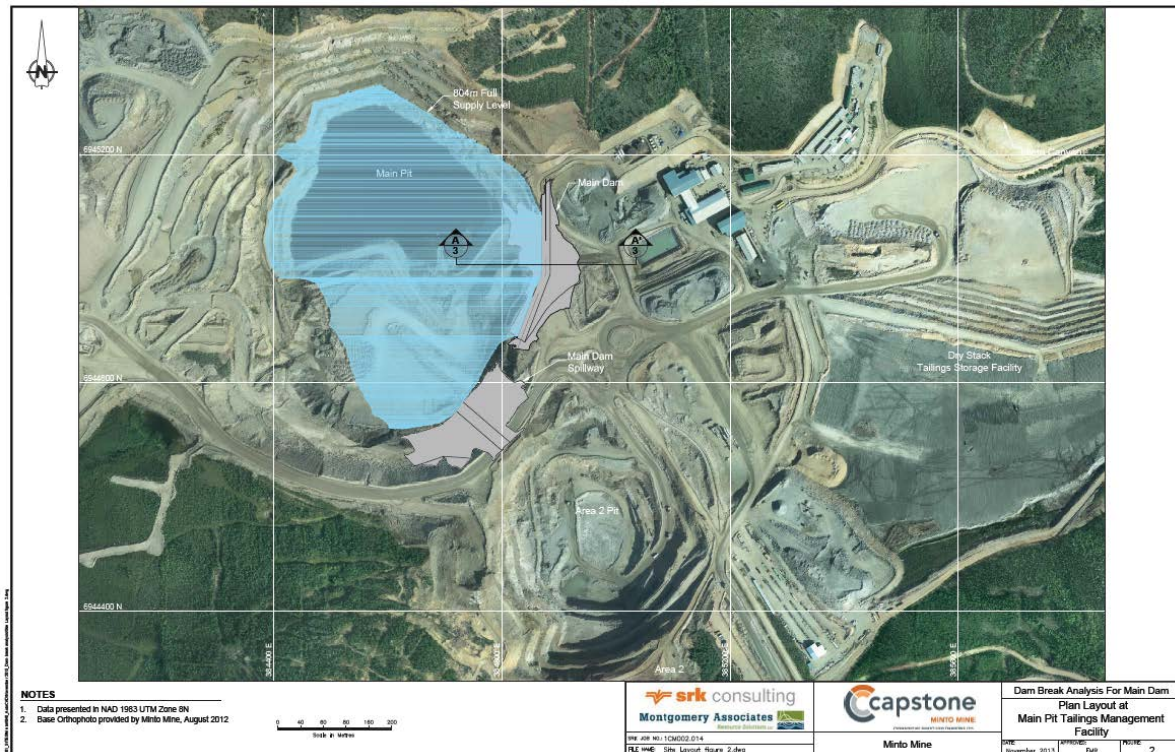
Plan layout for Main Pit Tailings Management Facility. Sourced from YOR 2013-0100-173-1.
